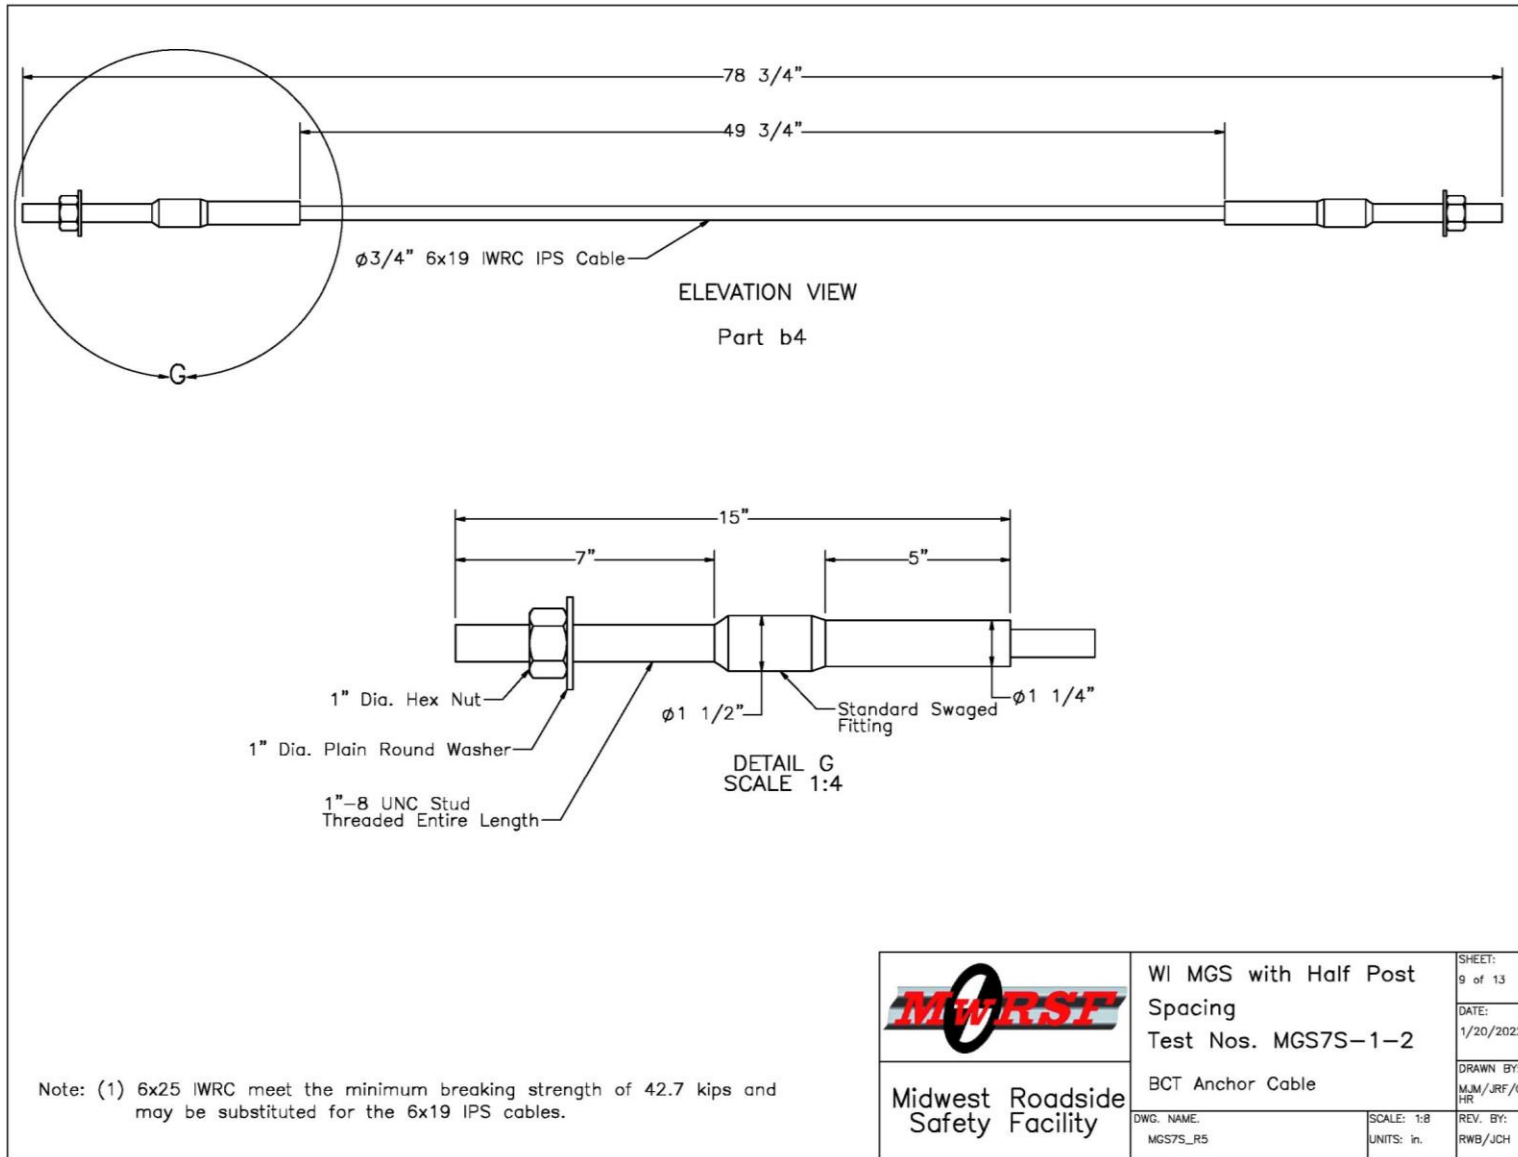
BCT Anchor Cable, Test Nos. MGS7S-1 and MGS7S-2
